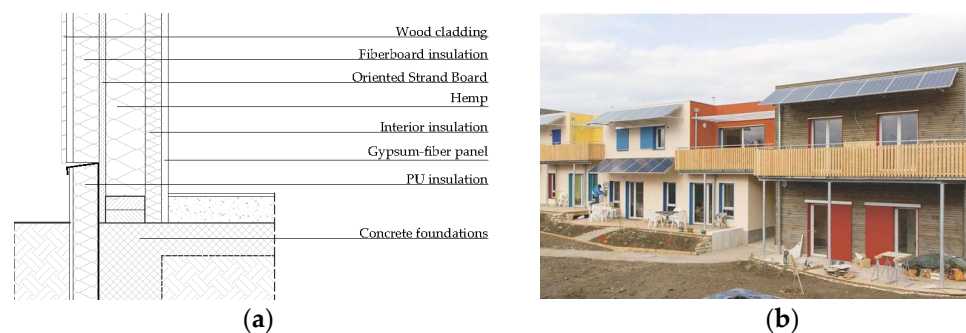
(a) Technical drawing of the exterior wall of the buildings (Source: Authors' drawing). (b) The steel structure used for the terraces (Source: cahiers-techniques-batiment.fr (accessed on 18 May 2023 [9])).
